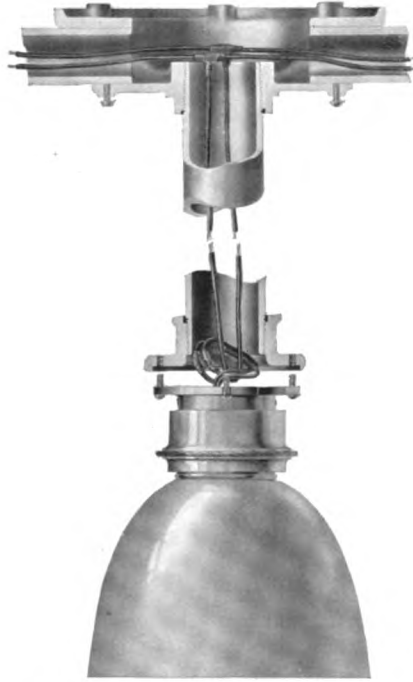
Universal Electric Lighting Fixture for Bag Racks, Paper Boxes and Storage.
